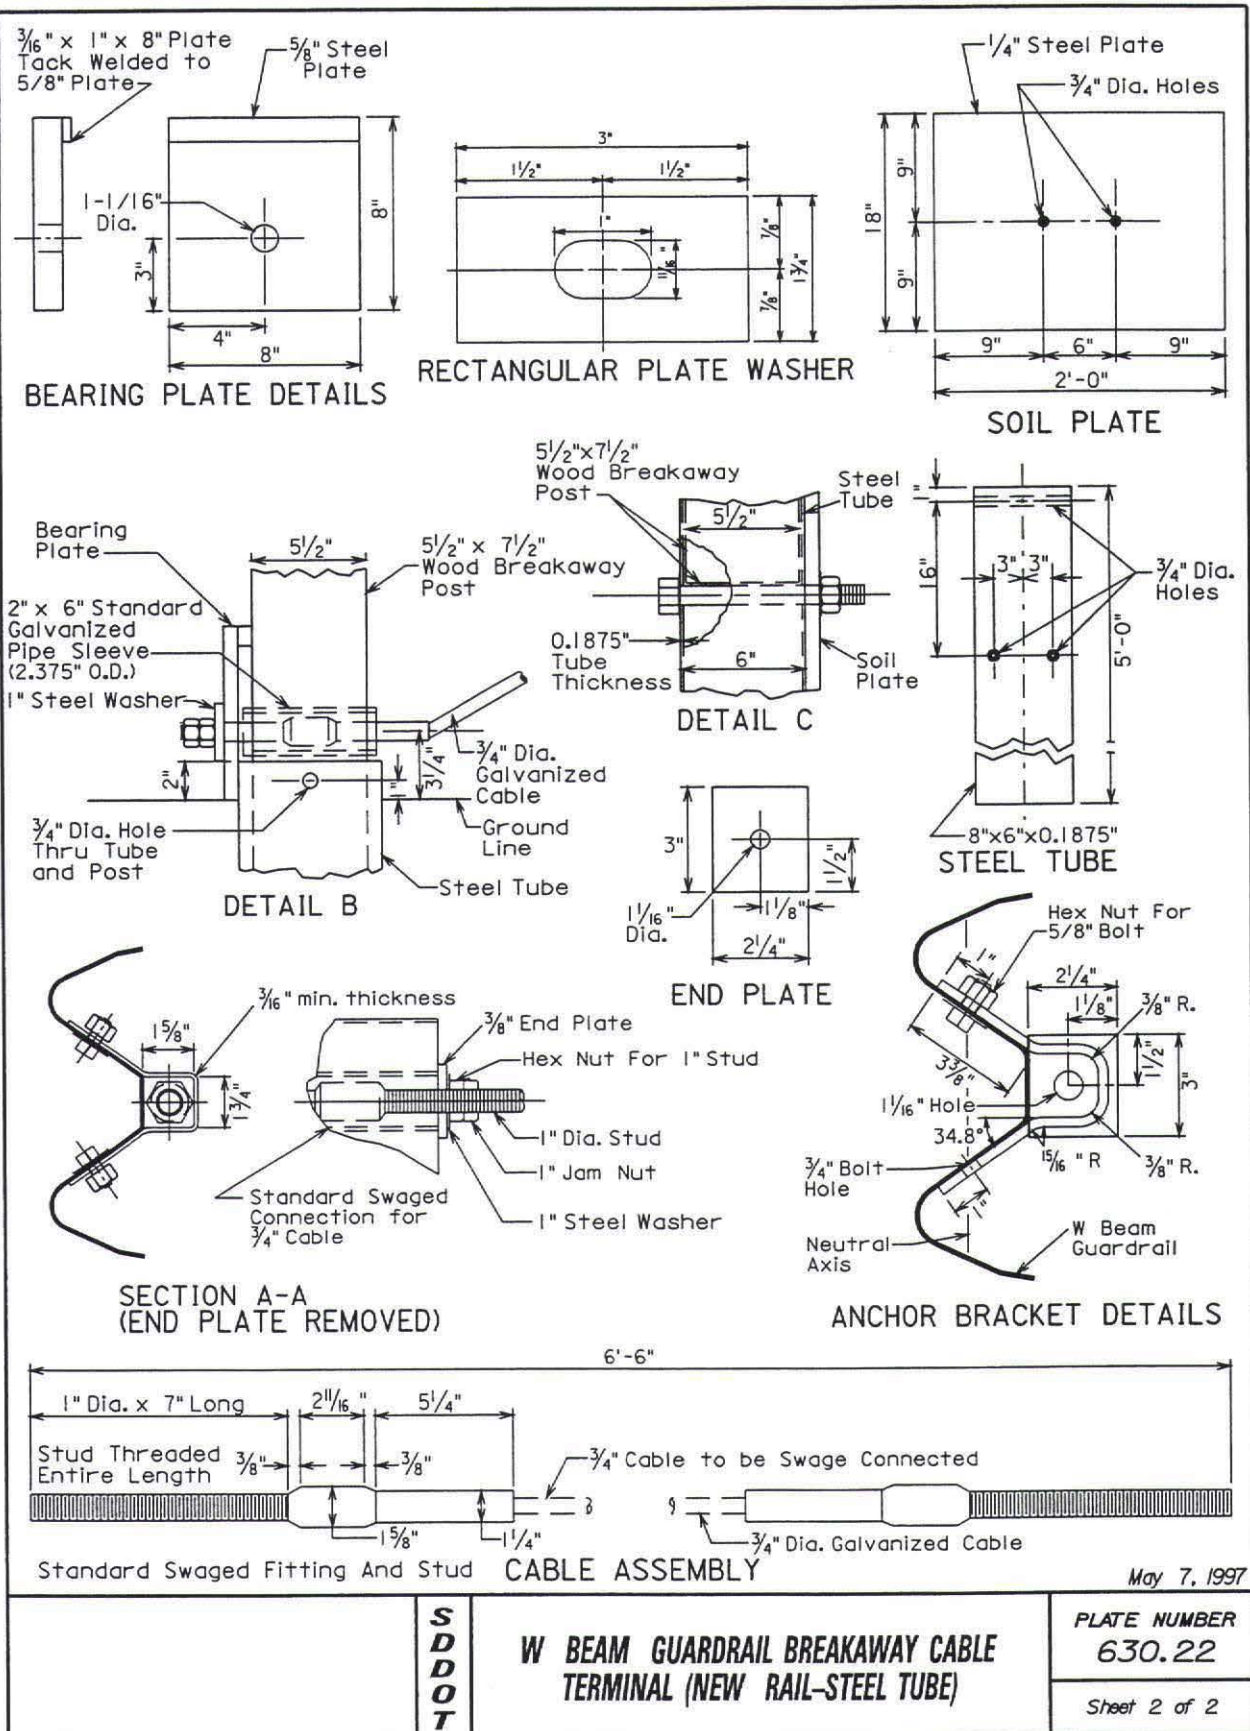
Cable Guardrail to W-Beam Transition Design Details (Continued)
